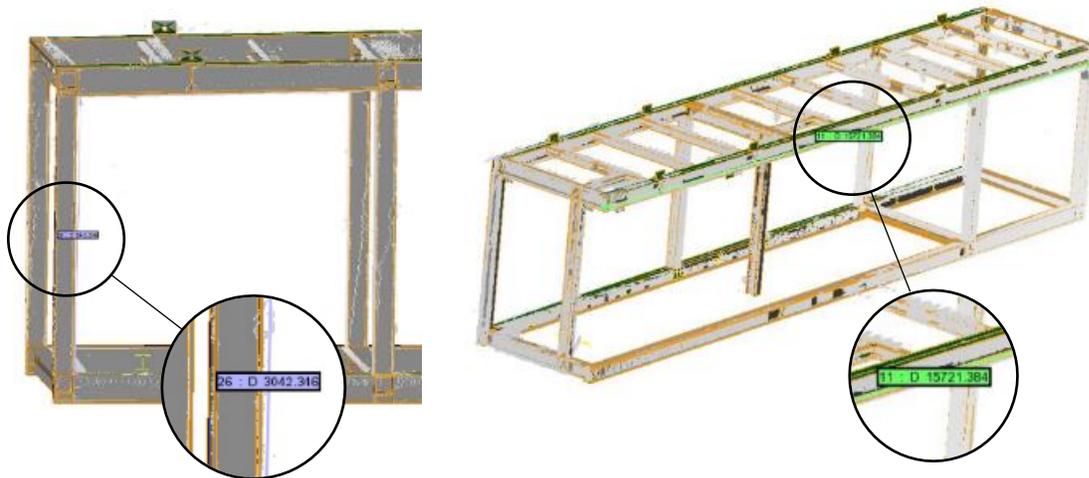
Sample extracted dimensions (in mm) from 3D point cloud model using PolyWorks®
